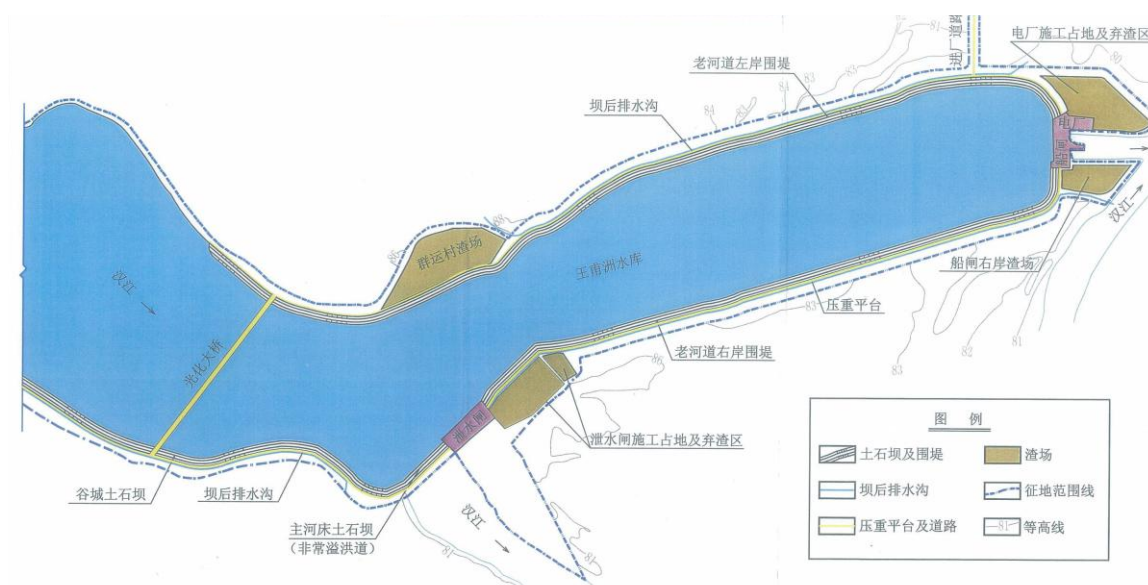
General layout of Wangfuzhou Hydro-junction
